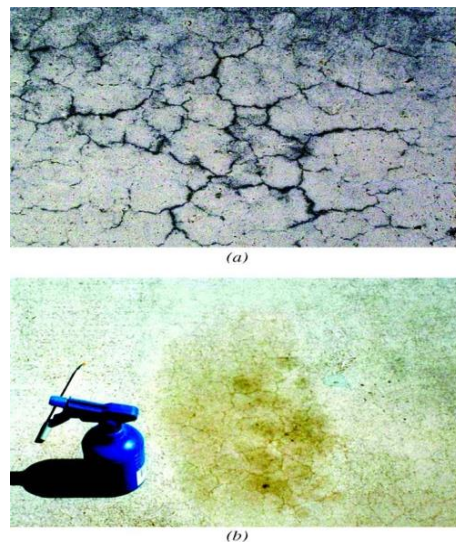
(a) Craze cracking; and (b) Craze cracking (ACI 201.1R-08)
